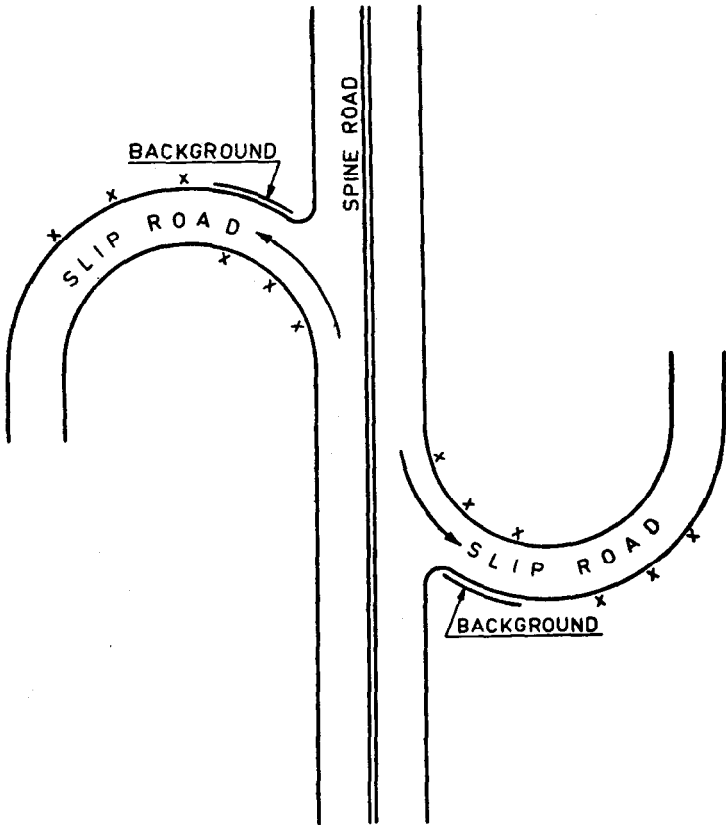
SITING OF COLUMNS AT THE ENTRY POINT OF SLIP ROAD
